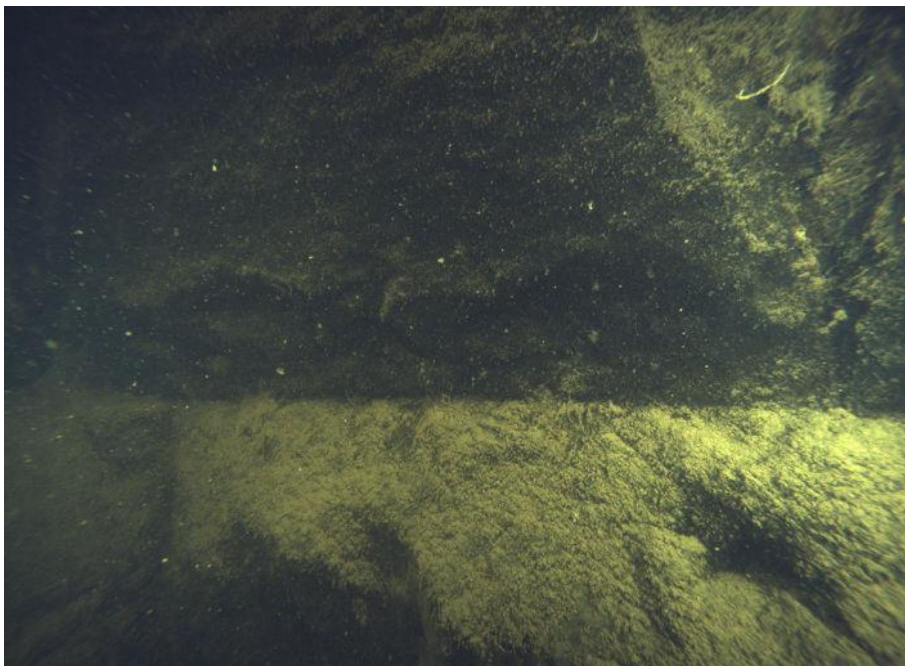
Example of stone blockwork near surface level at the western end of dam wall. The blockwork was found to be intact with no signs of major cracking observed. Grouting appeared to be in place with no instances of missing grout identified.
